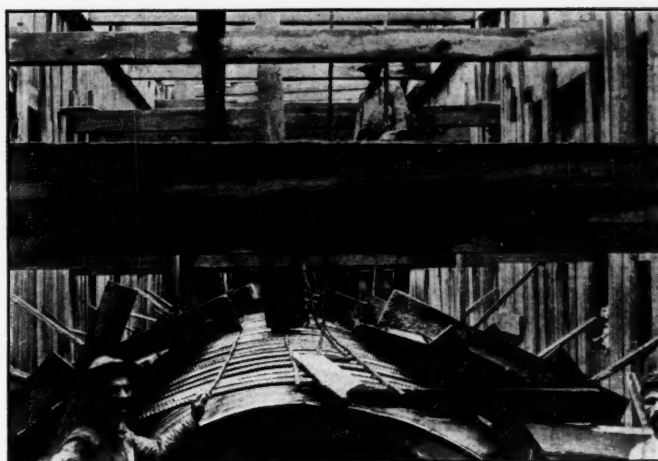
MYRTLE AVENUE TRUNK SEWER
